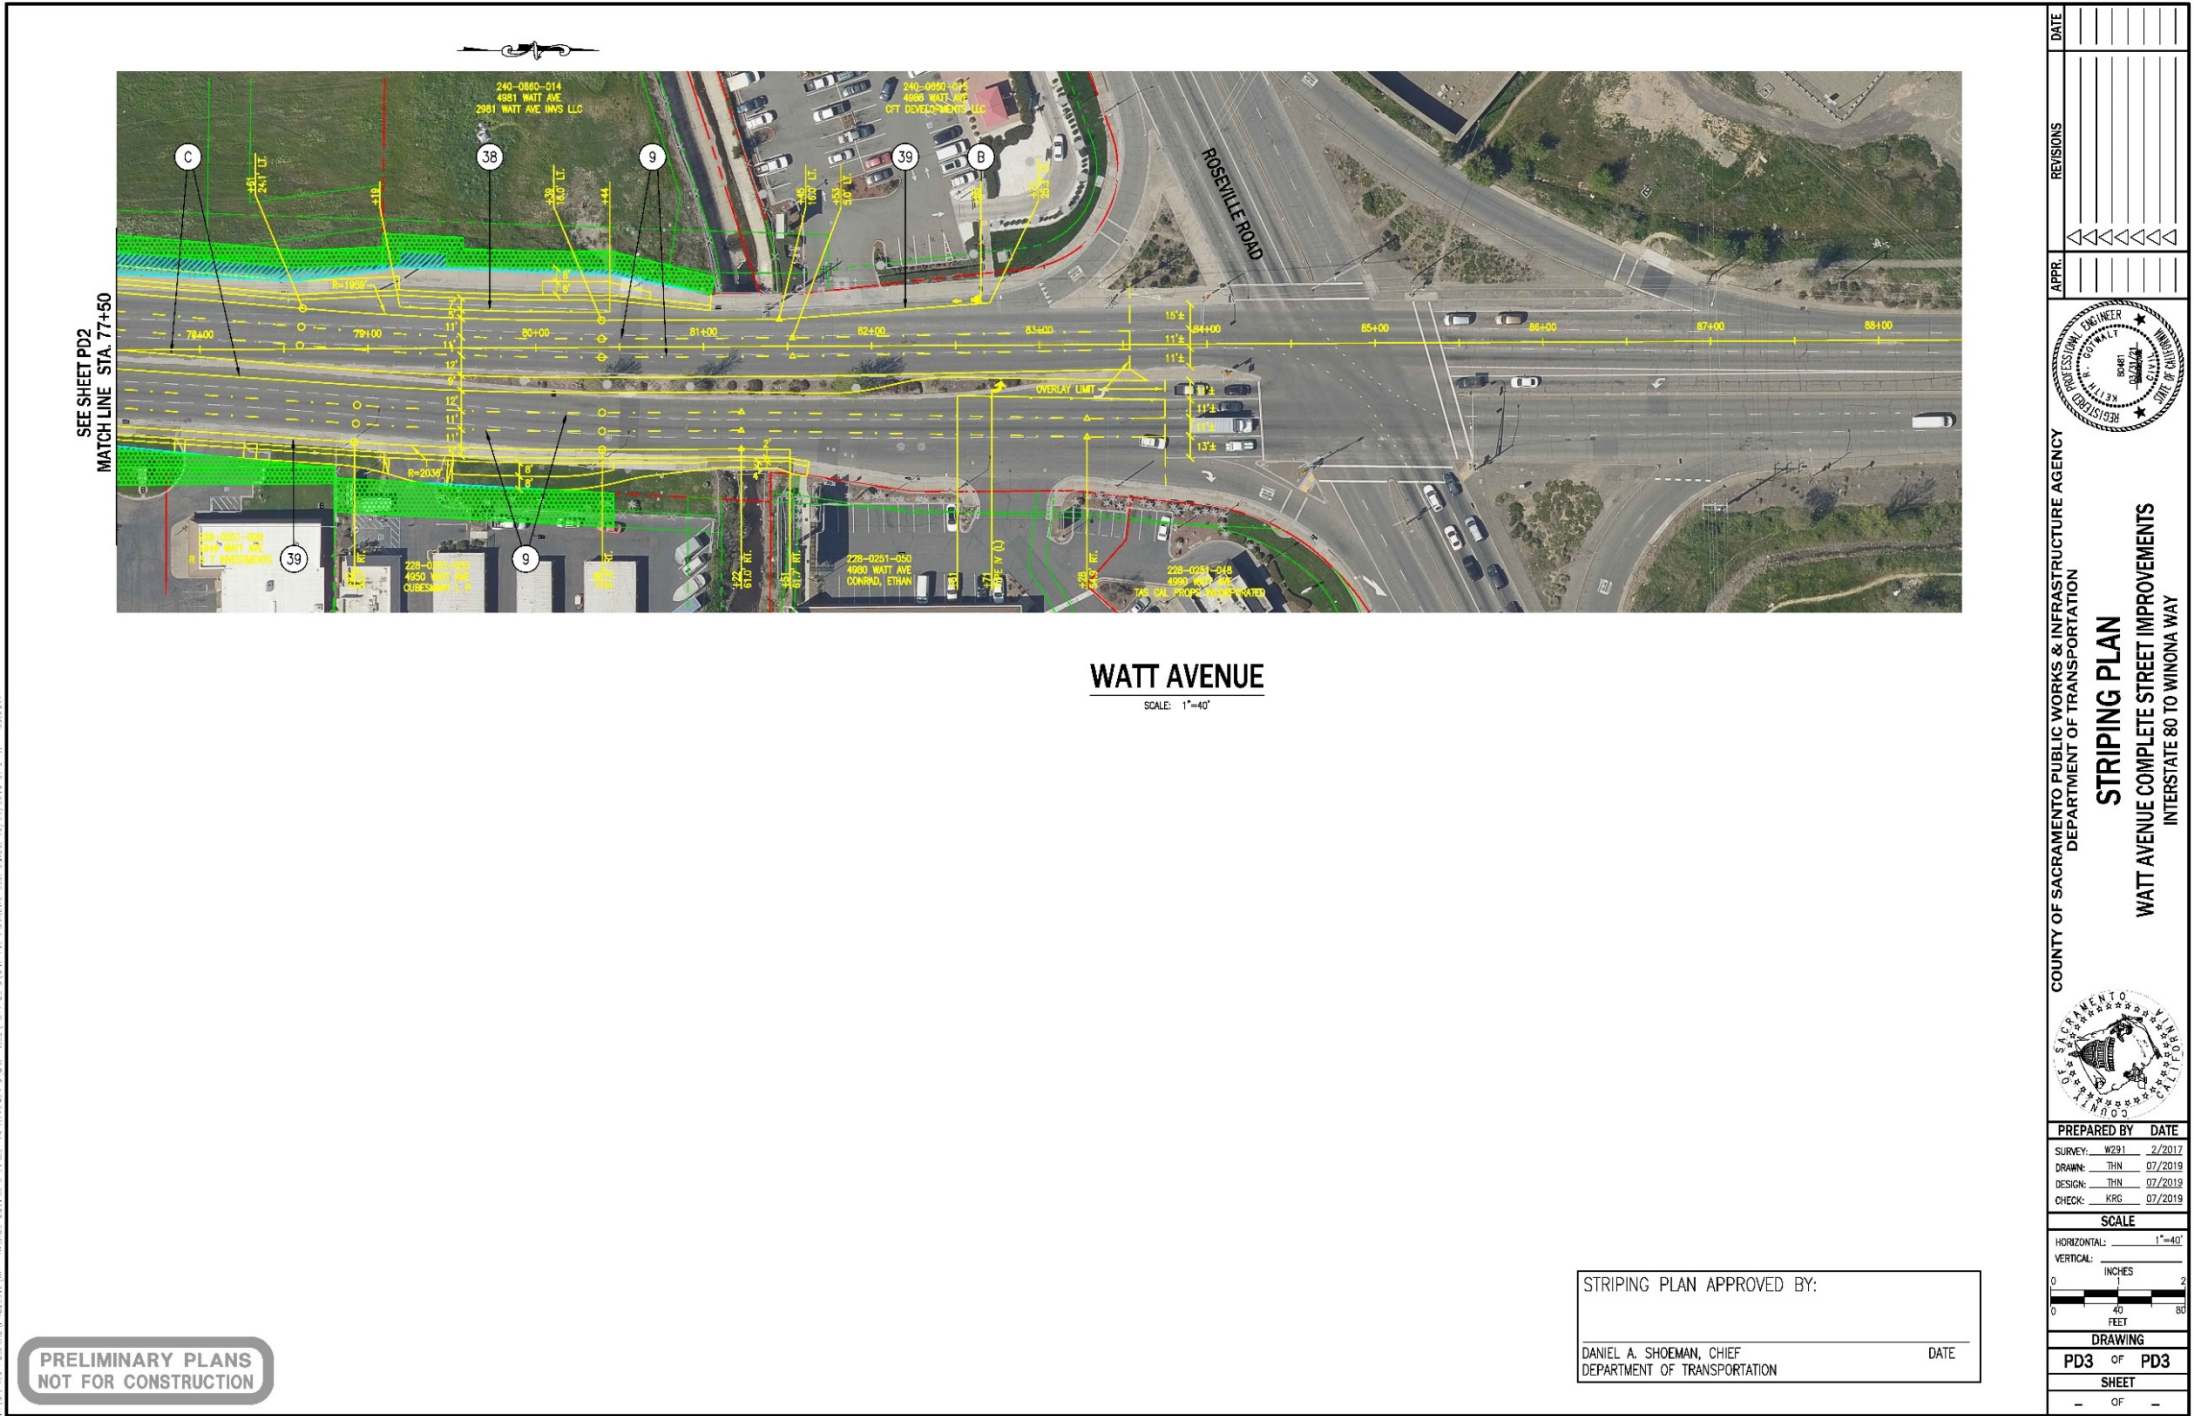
Striping and Right-of-Way Acquisition Plan
